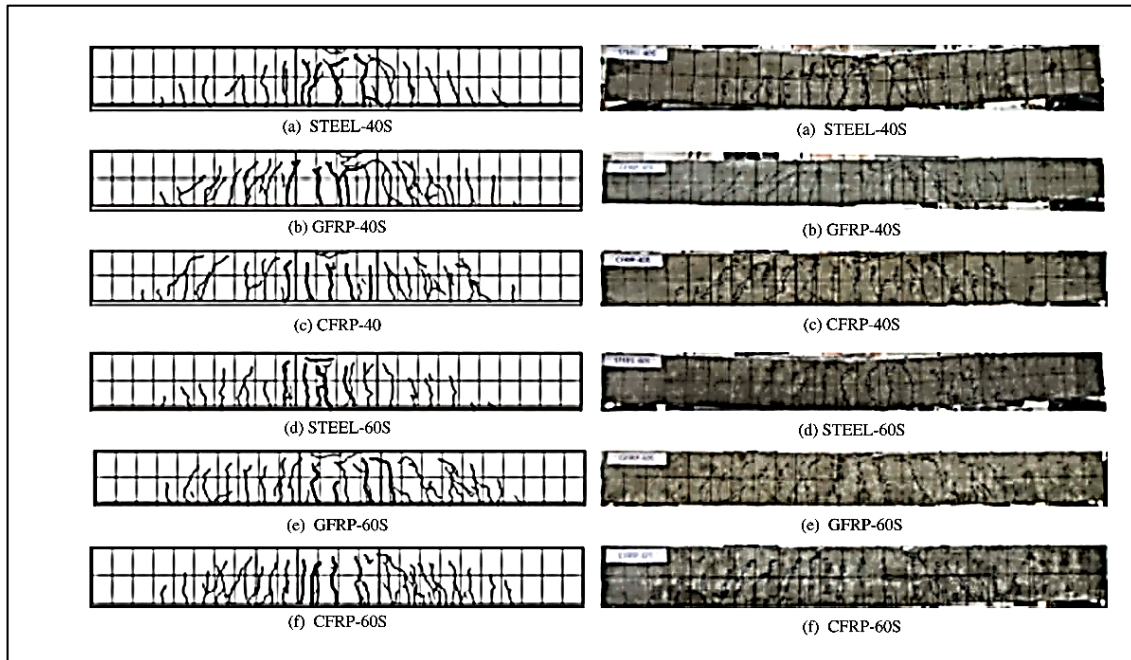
Crack pattern of concrete beams tested by Kim and Kim [21]
